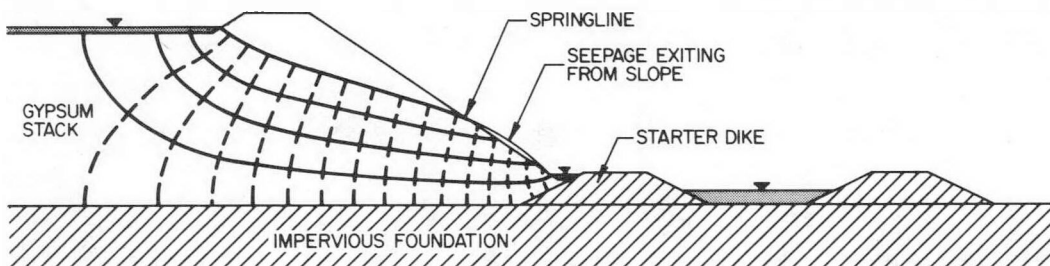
Seepage Pattern Through a Gypsum Stack on an Impervious Foundation
